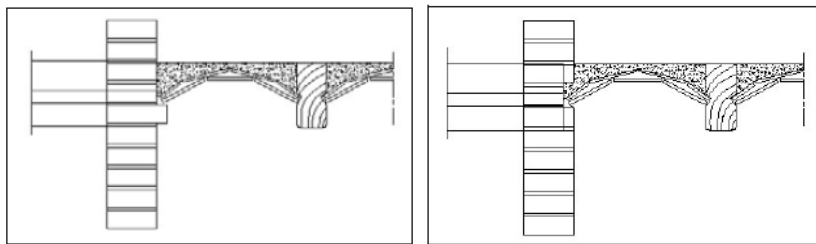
Different solution for supporting the unidirectional floor system with timber beams and ceramic vaults on masonry resisting walls parallel to the floor's beams: placing a brick out of the masonry wall (left) or making a horizontal slot in the masonry wall for supporting the ceramic tile vault (right) (Paricio Casademunt, 2001).
